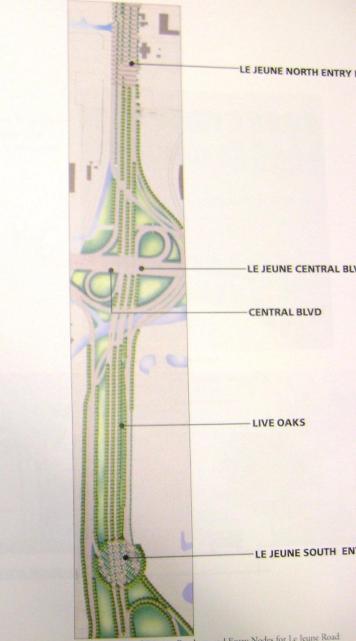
Plan of Primary Roadway and Entry Nodes for Le Jeune Road
